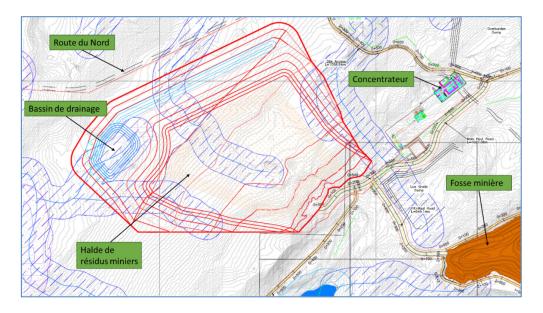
Extract from the general layout of the site showing the tailings pile (Extract from layout drawing DRA A1-C2781-0001-L, vol.2 of the ESIA)
